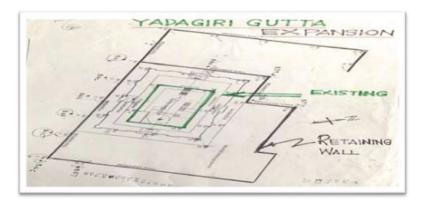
Plan showing the Existing Temple and the proposed Retaining Wall
